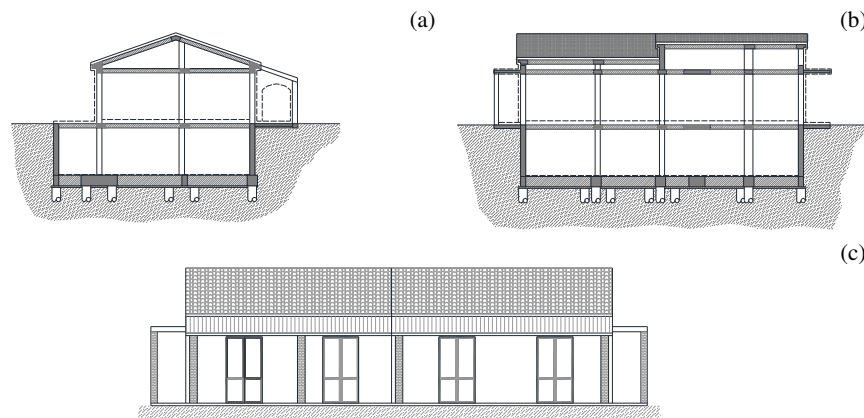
Building 2: (a) section in North-South direction, (b) section in East-West direction, (c) façade.
